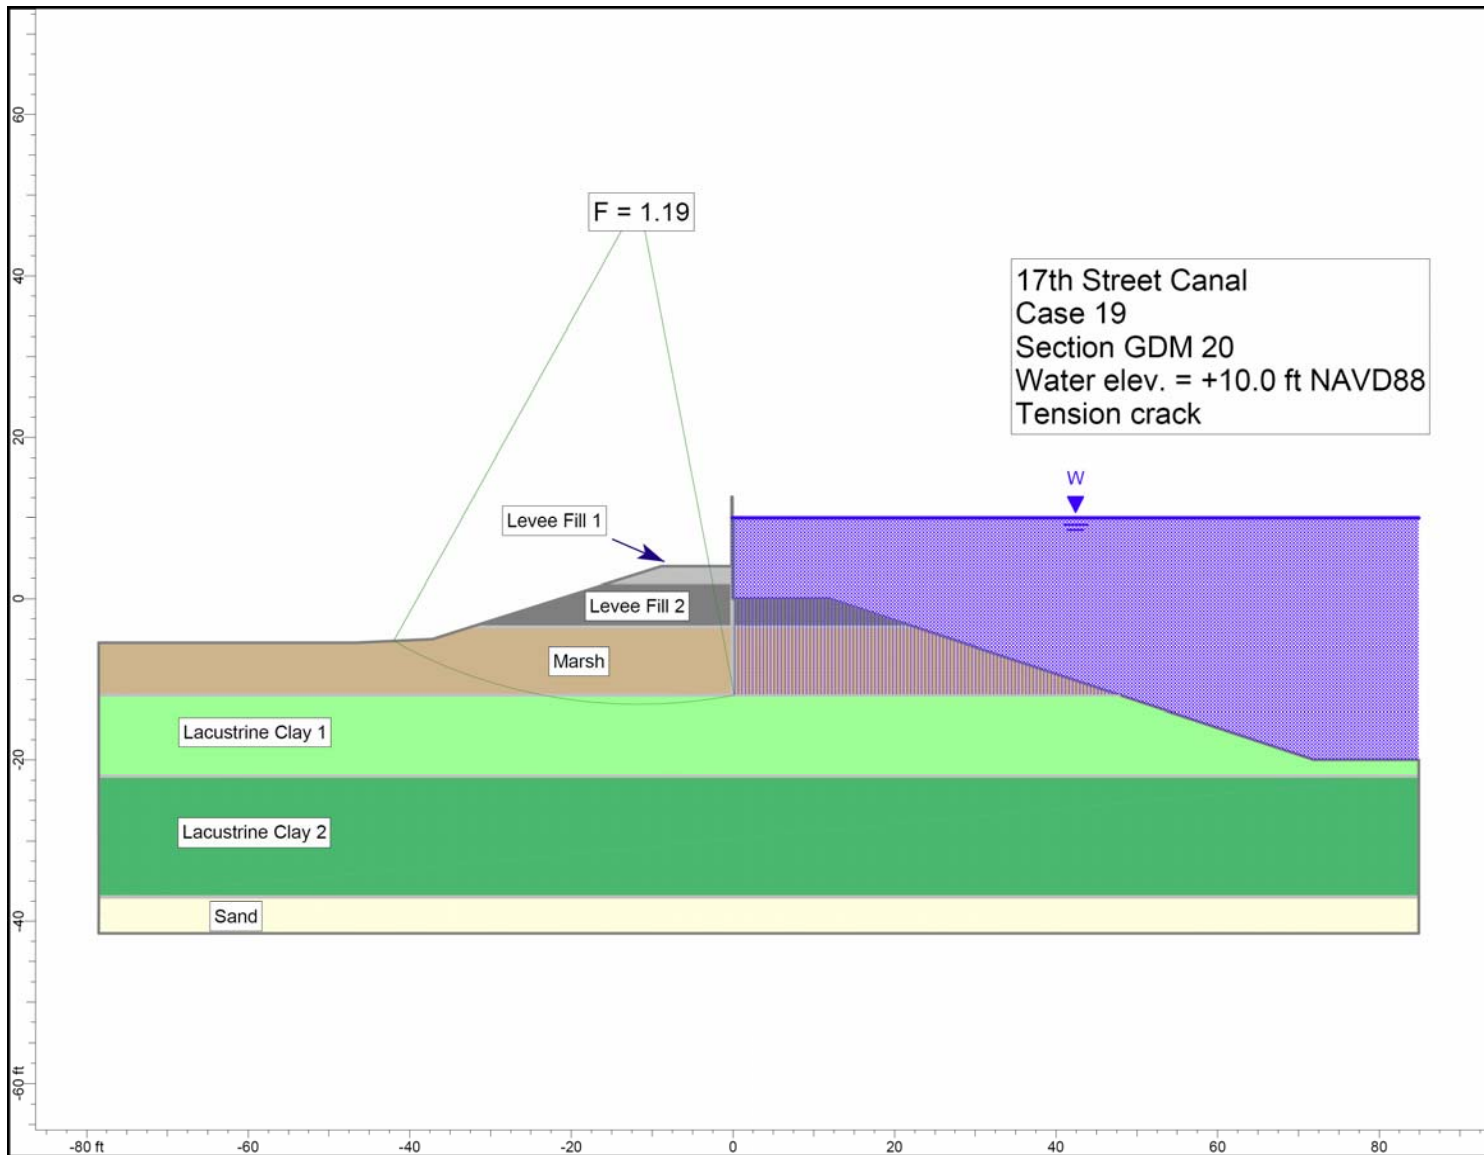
Critical Circle for 17th Street Canal Design Cross Section – Water Elevation 10 ft, Tension Crack
